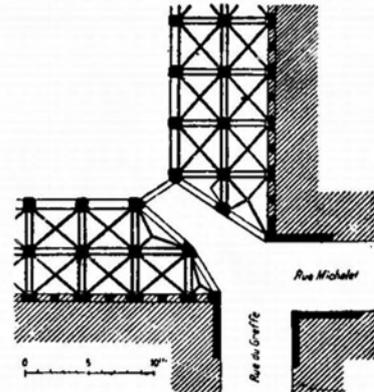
MONTAUBAN: PLAN OF ARCH OVER ENTRANCE & MARKET SQUARE
